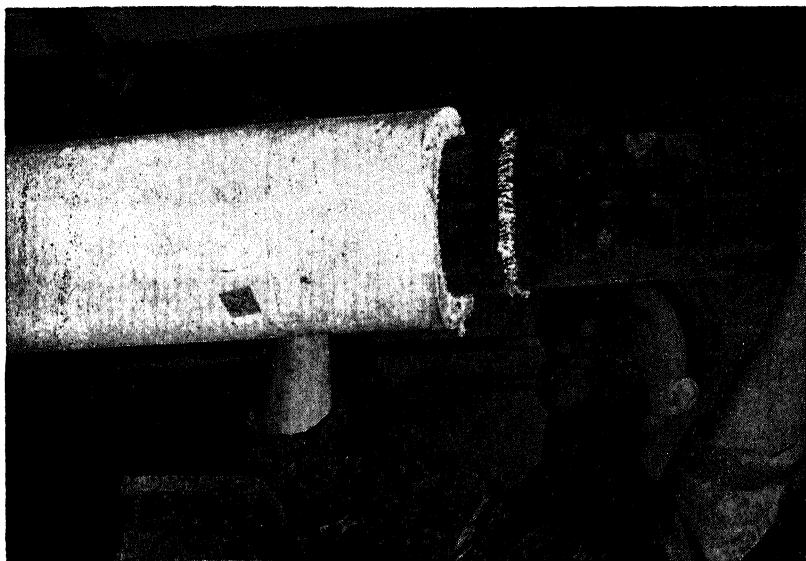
Insulating a 6-in. arc welded steam line. Absence of couplings in the line makes it possible to fit standard asbestos covering without cutting around and cementing at the joints, saving half the time formerly required.
